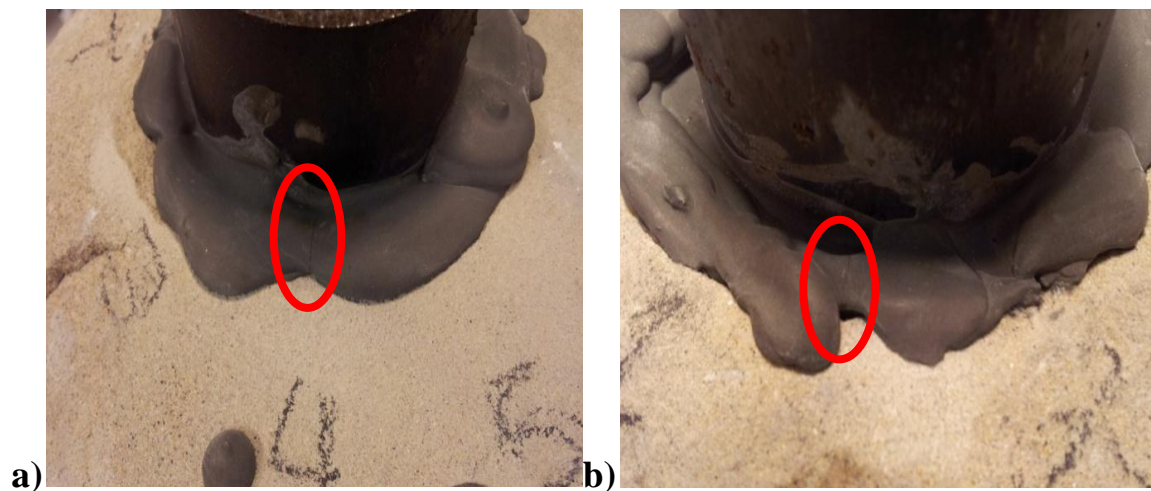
50% casing stand-off sample. (a) Crack adjacent to sensor 4. (b) Crack between sensor 1 & 2.
